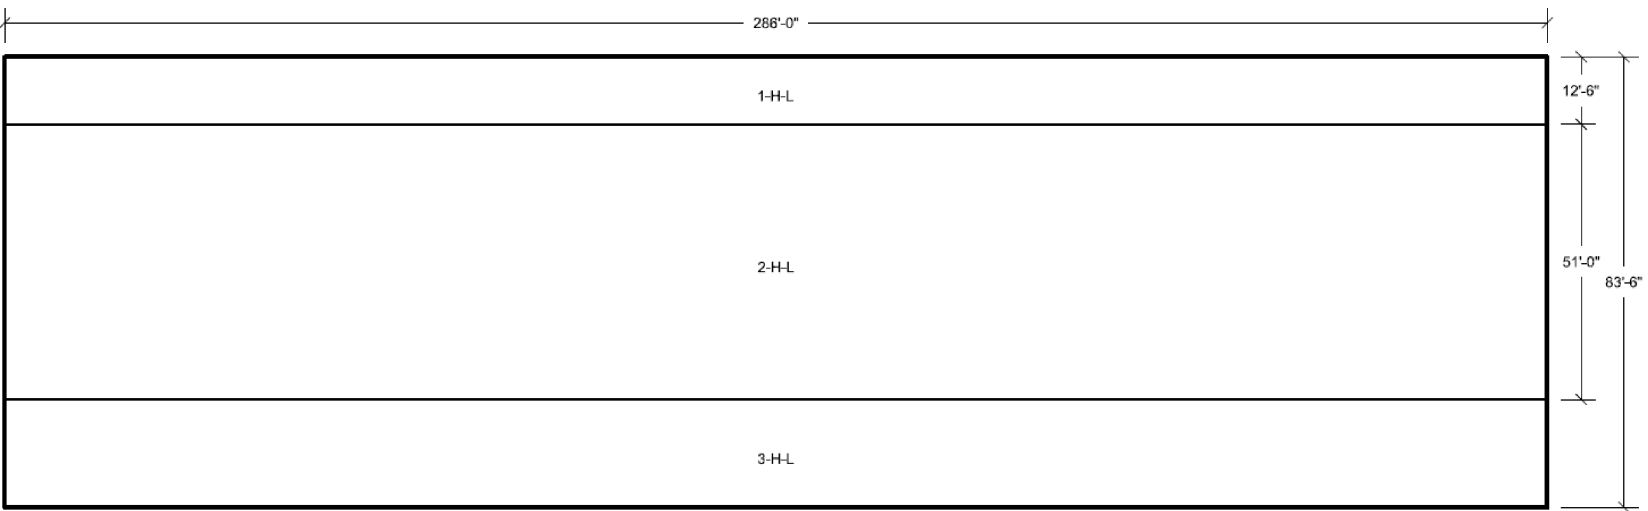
H.6-82 UHS Basin North Wall Looking South Horizontal Reinforcement Zones Near Side Face
